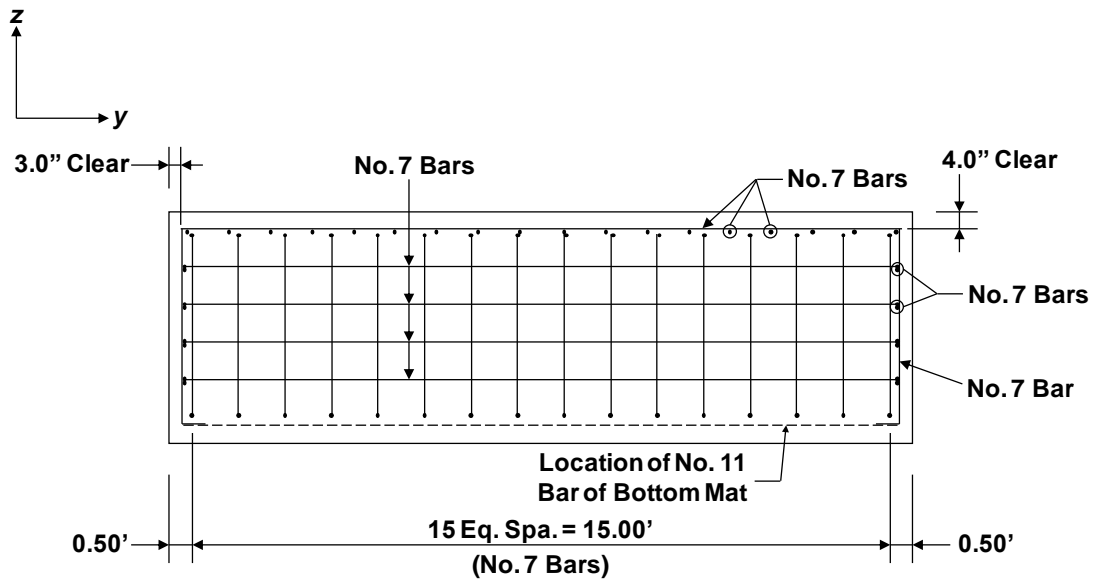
Reinforcement details – Section A-A (shrinkage and temperature reinforcement)
